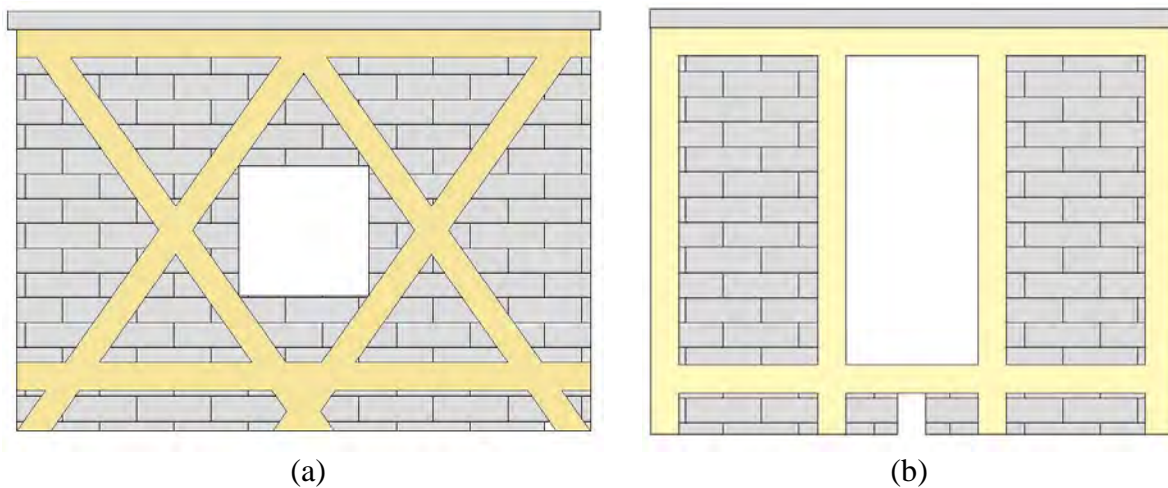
A schematic diagram of the reinforcement on the masonry building; (a) sides 1-2 and 5-6, (b) sides 3-4 and 7-8.
